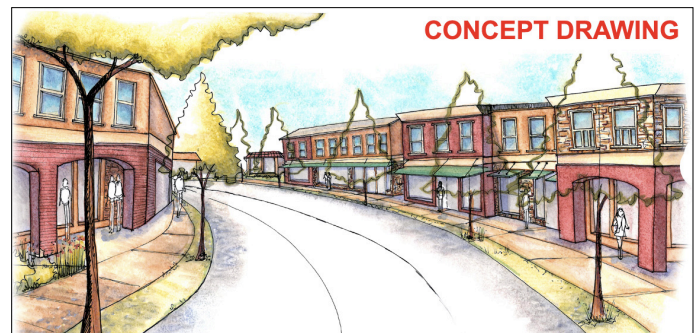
Concept drawing showing recommended exterior finishes, multi-storied buildings with large amount of windows
